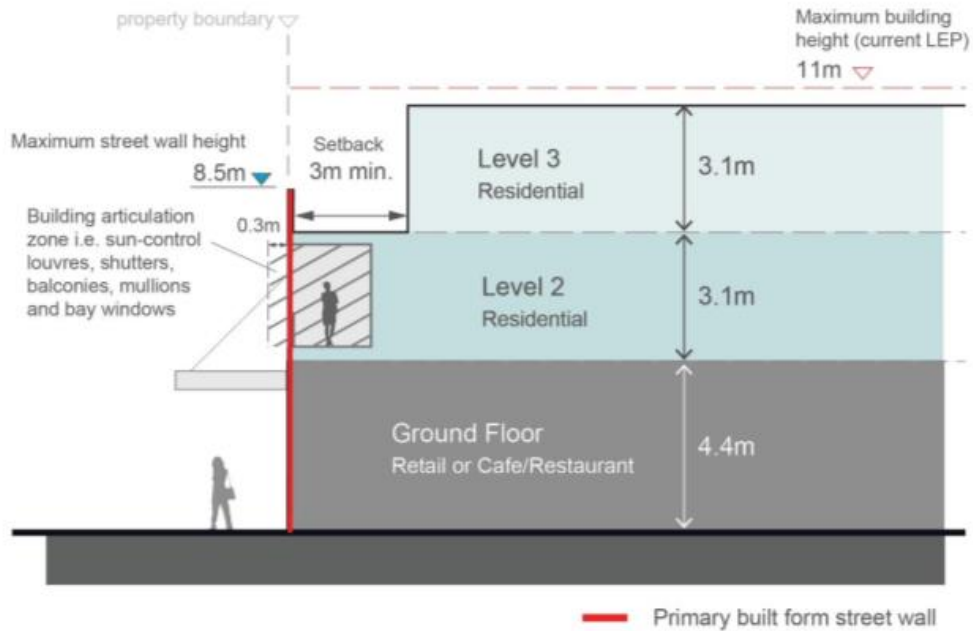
Typical 2 storey street wall section predominant within the historic 'Harbourside' Precinct
